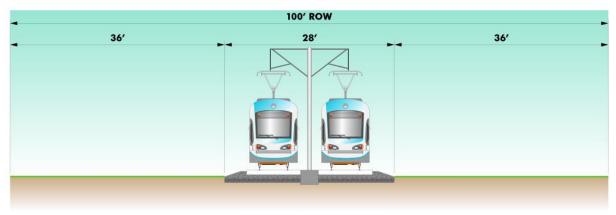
Enhanced Streetcar Typical Section - Rock Island Railroad Existing Conditions
